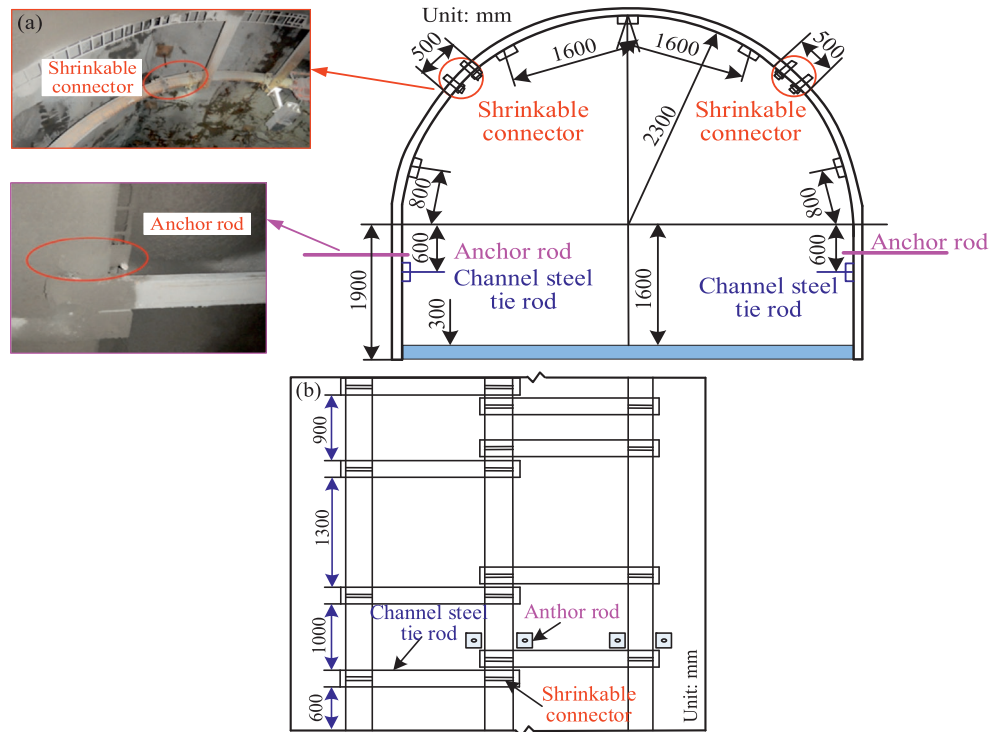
Schematic of secondary support for weakly cemented tunnel. (a) Schematic of tunnel support cross-section, and (b) side view of tunnel support.
